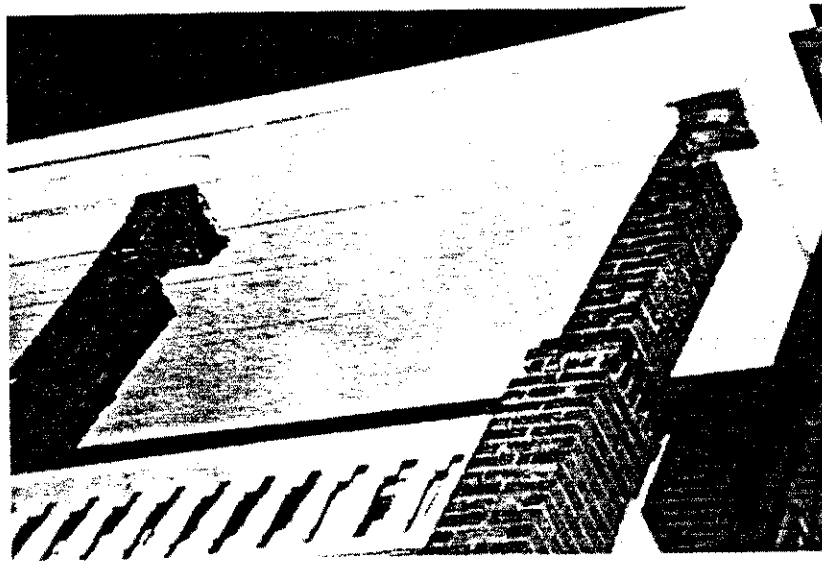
1988 Saguenay earthquake; flexural failure of unreinforced masonry pilaster, multi-units residential building in downtown Québec (Gilles Fréchette, personal communication).
